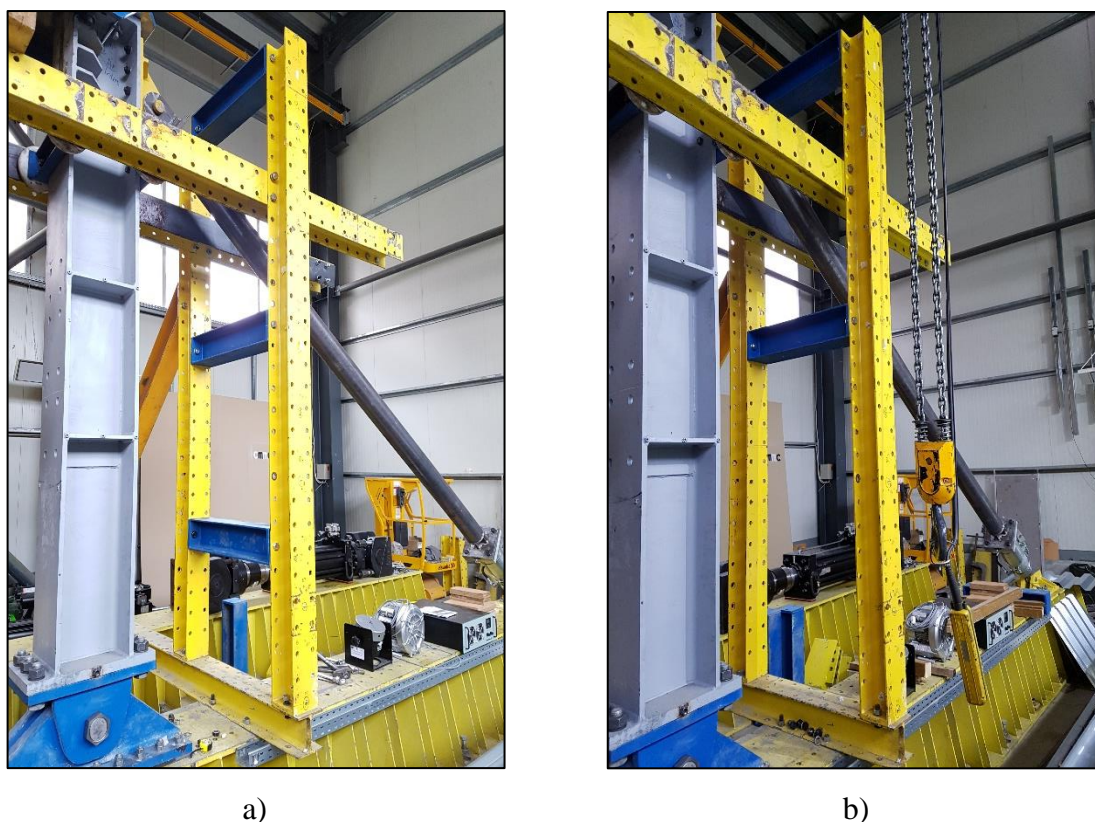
Simple steel frame in the laboratory (test structure): a) intact frame (Case A);
